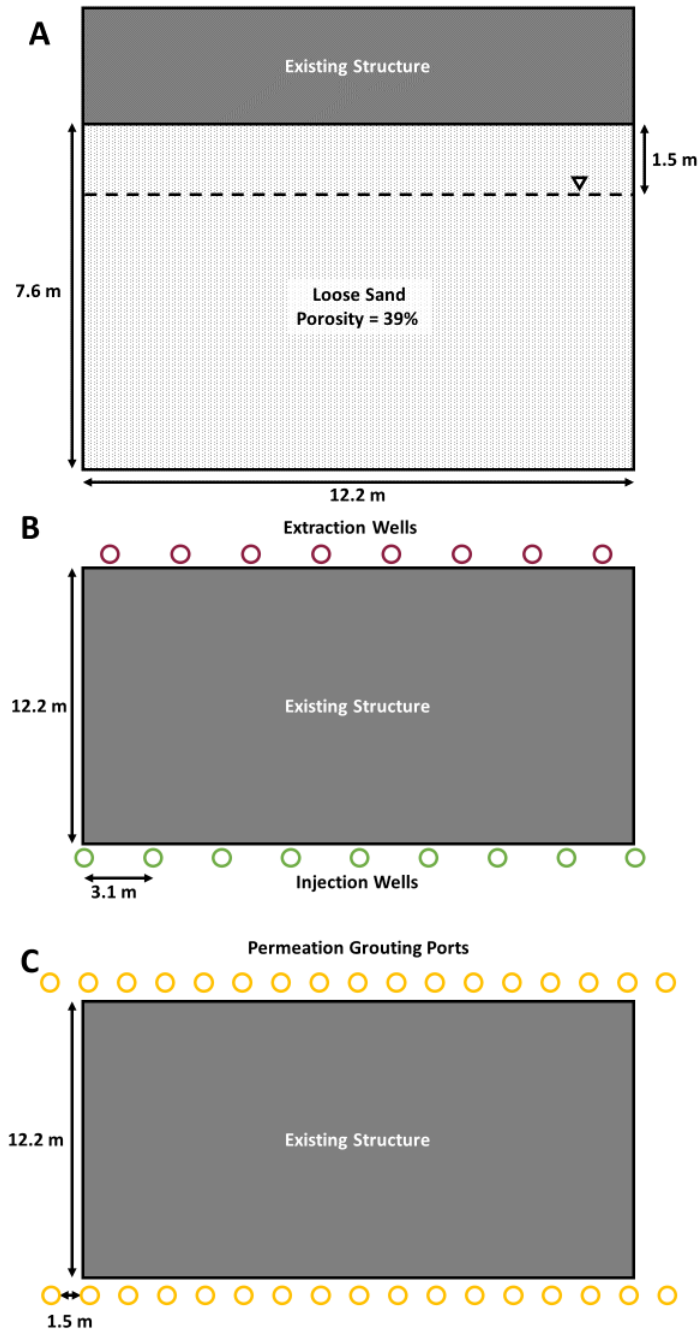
[A] Section View, [B] Plan View Schematic of the Test Case for Evaluating Liquefaction Mitigation via MID Beneath an Existing Structure, and [C] Plan View Schematic of the Proposed Permeation Grouting Port Placement
